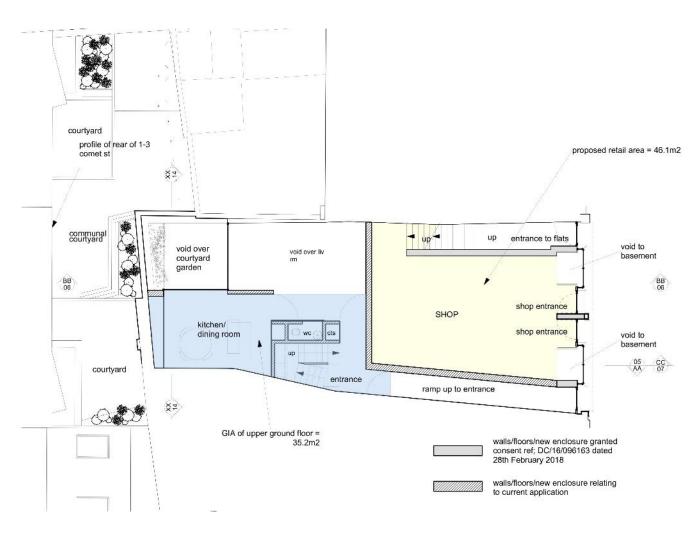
Plan of proposed ground floor layout (Tillman Architects, Dwg. No. 230-02-15 E, Jul 2015)
